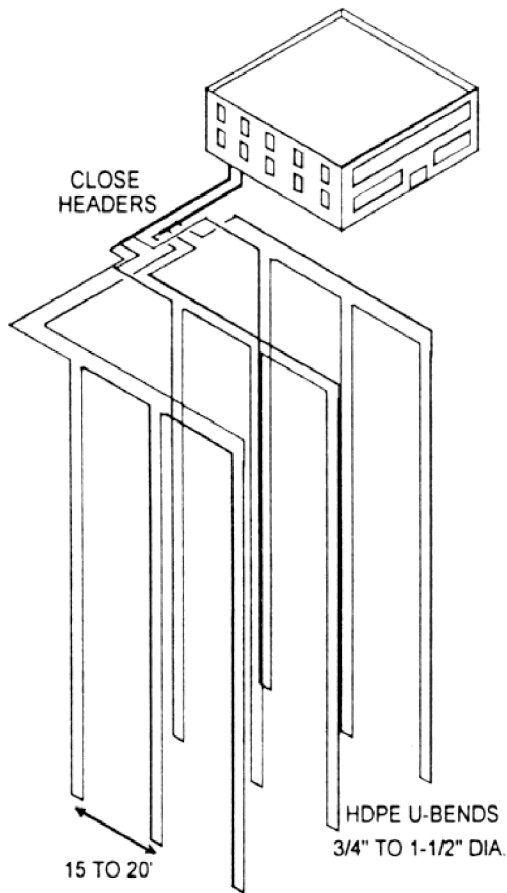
TYPICAL VERTICAL GROUND COUPLING SYSTEM
